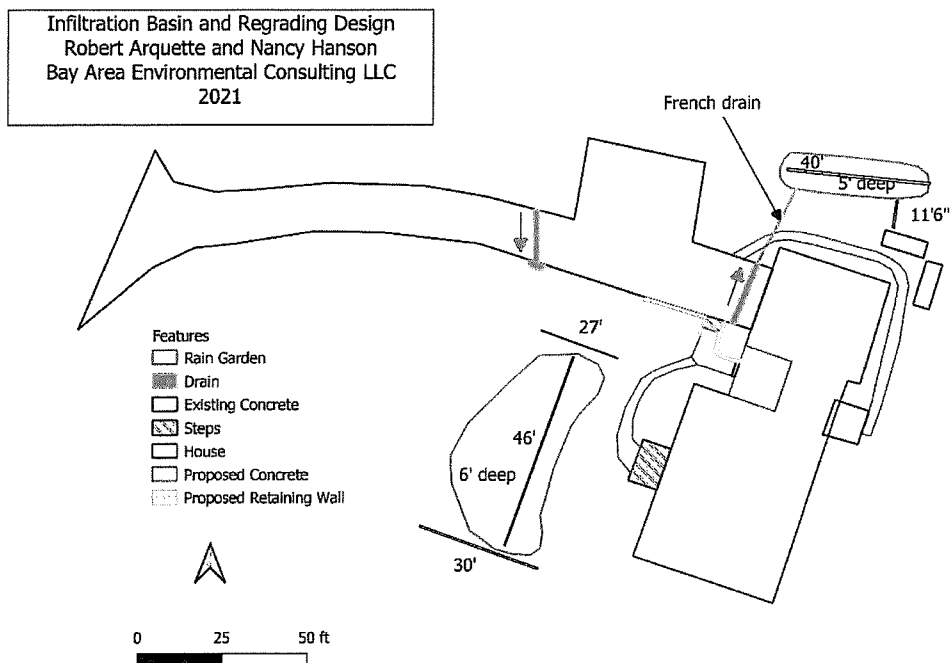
Proposed layout of stormwater infrastructure and concrete structures.
